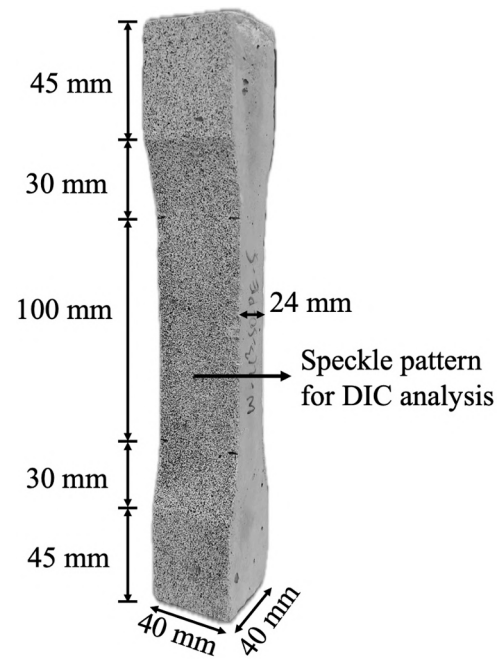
Dumbbell-shaped specimen for uniaxial tension test equipped with speckle pattern.
